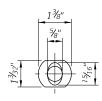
DETAIL 'S' - HALF SPACING ELEVATION (AS REQD. PER THE PLANS)
